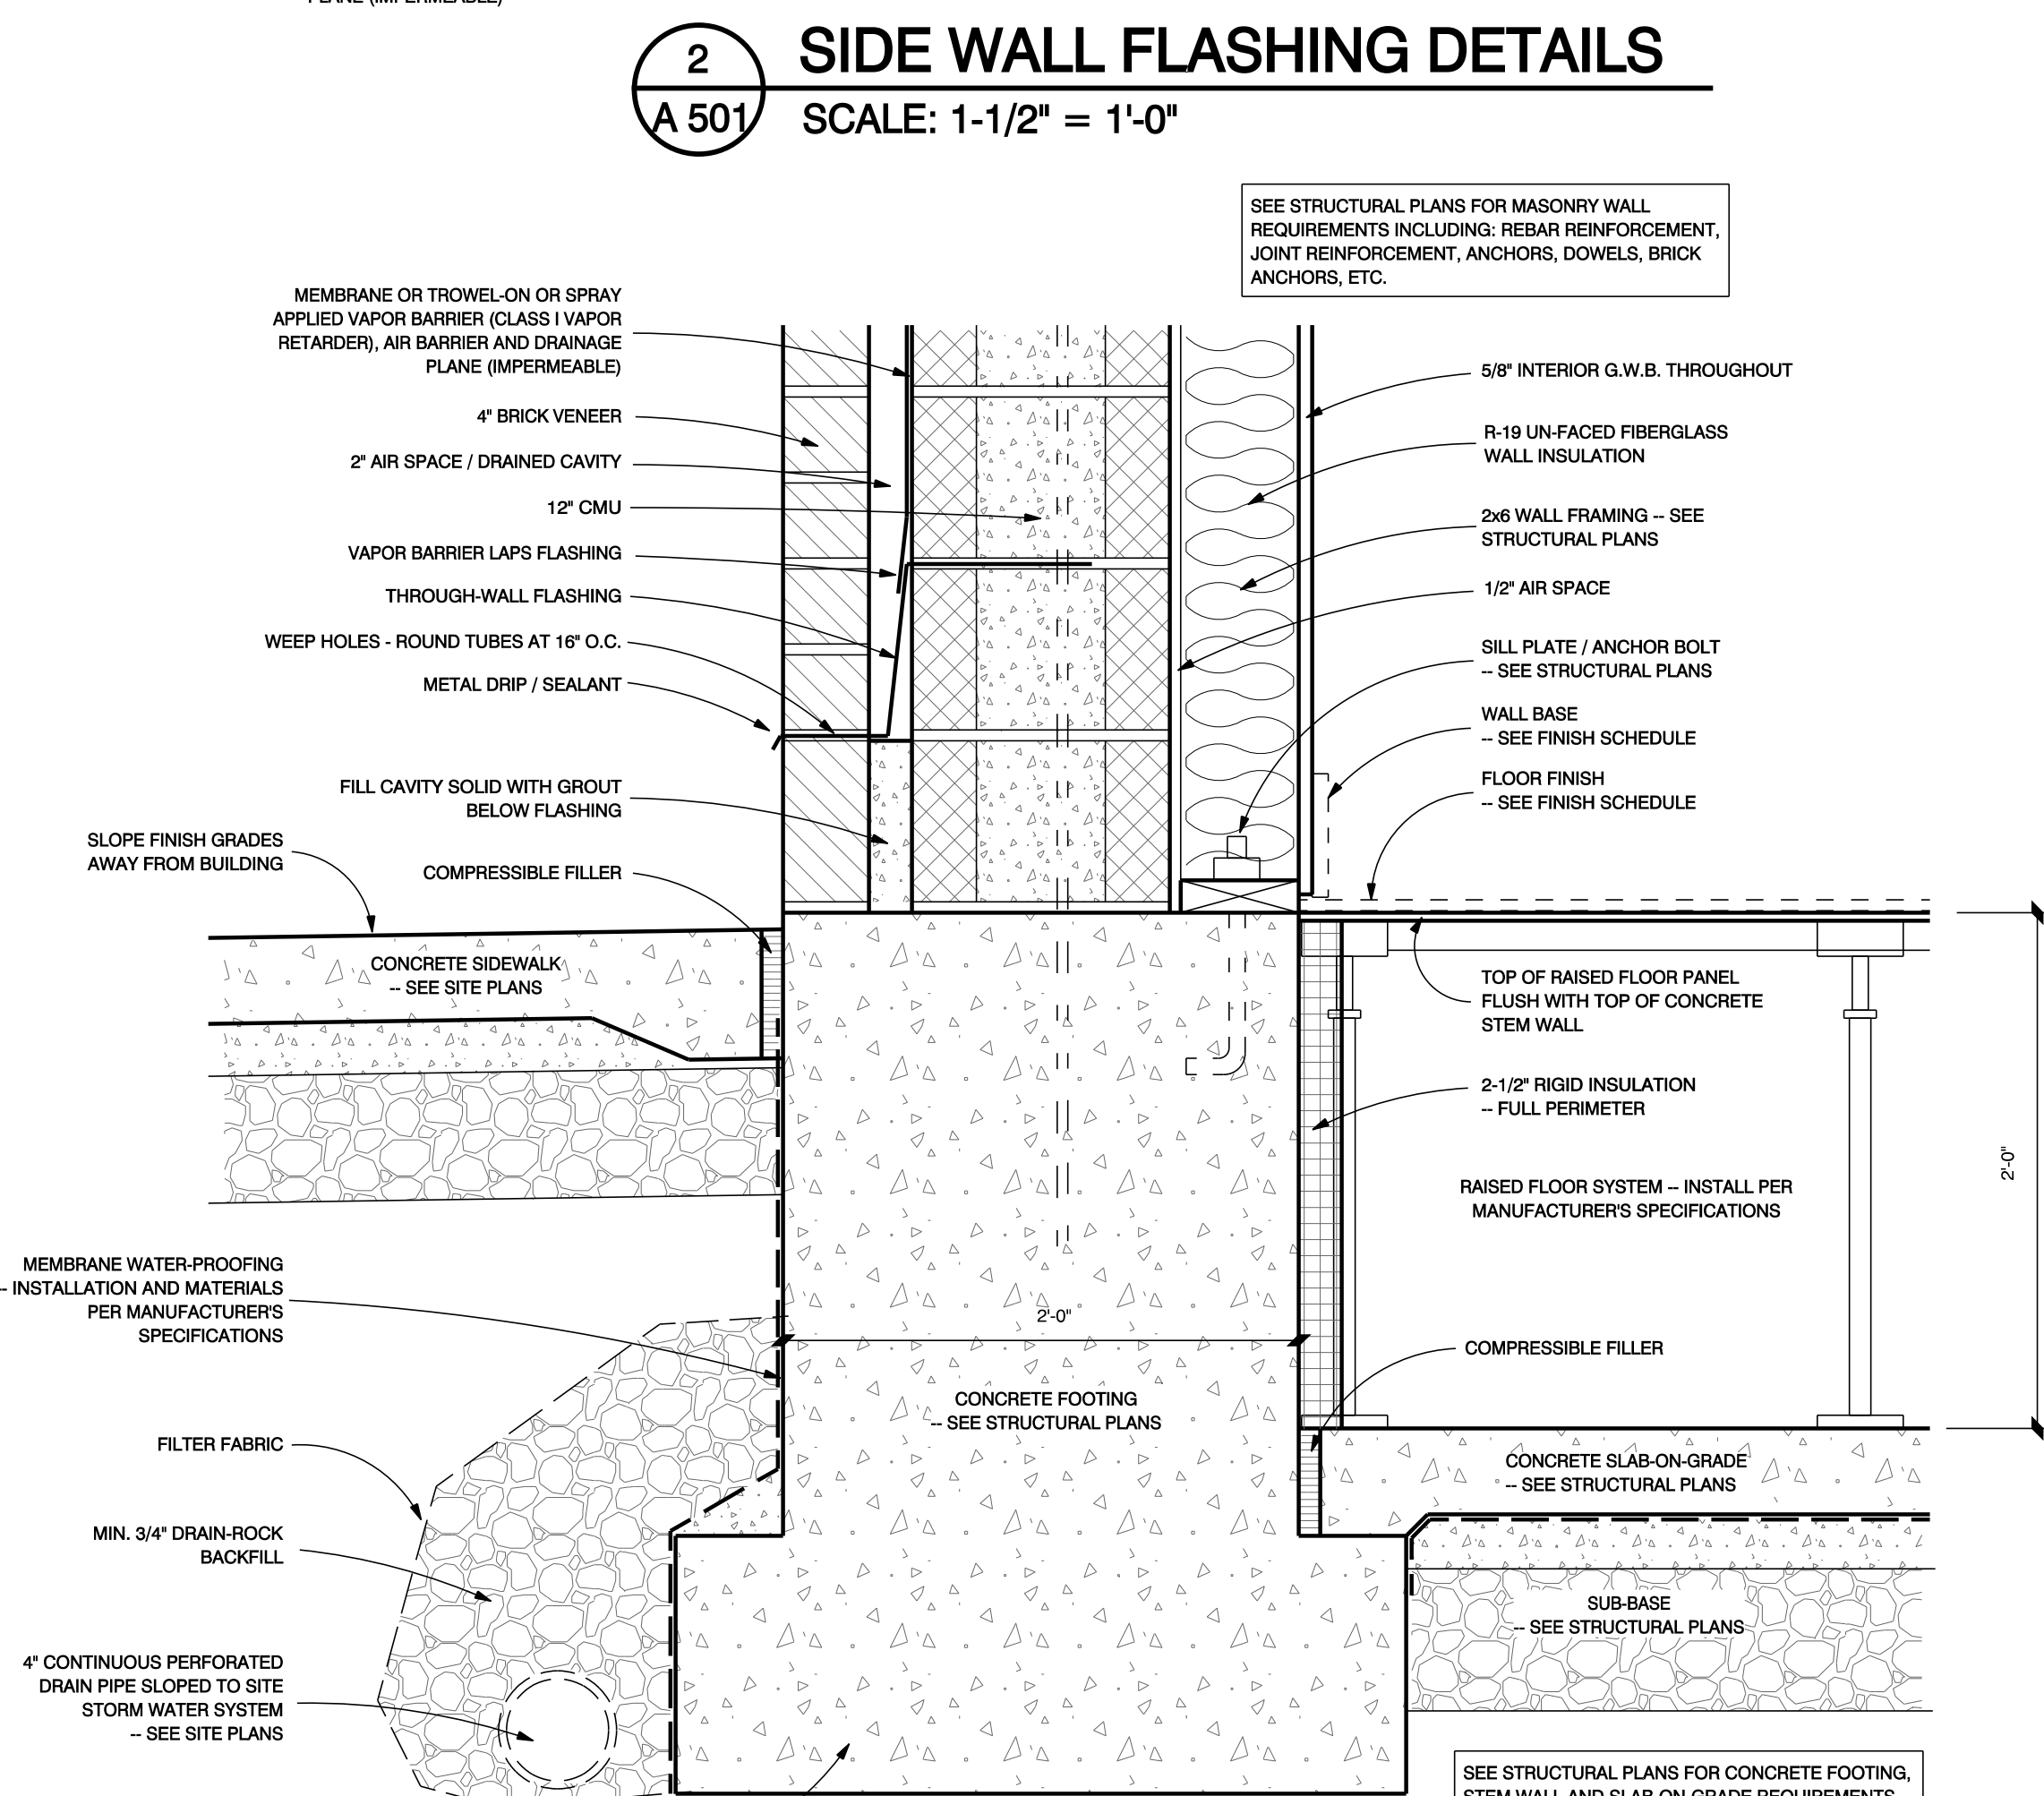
DETAILS AND NOTES AS PER BRICK INDUSTRY ASSOCIATION TECHNICAL NOTES ON BRICK CONSTRUCTION DOCUMENT 21-B
